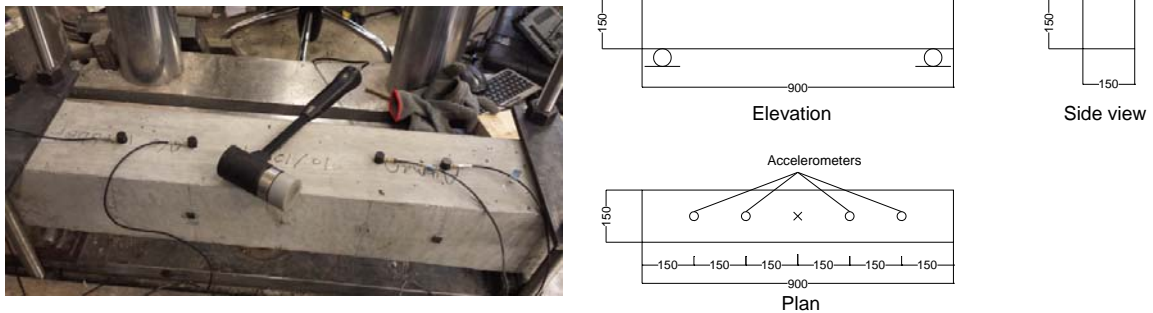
Impact hammer test setup (dimensions in mm: 1 inch = 25.4 mm)
